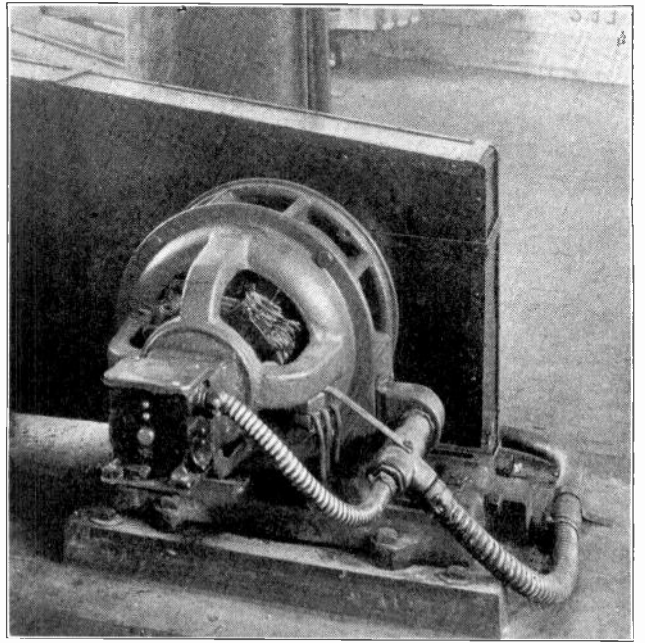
Induction motor installation, using rigid conduit to bring the wires up to the motor, and flexible conduit to attach to the motor to allow it to be moved slightly for belt adjustment. Courtesy of G. E. Company.
